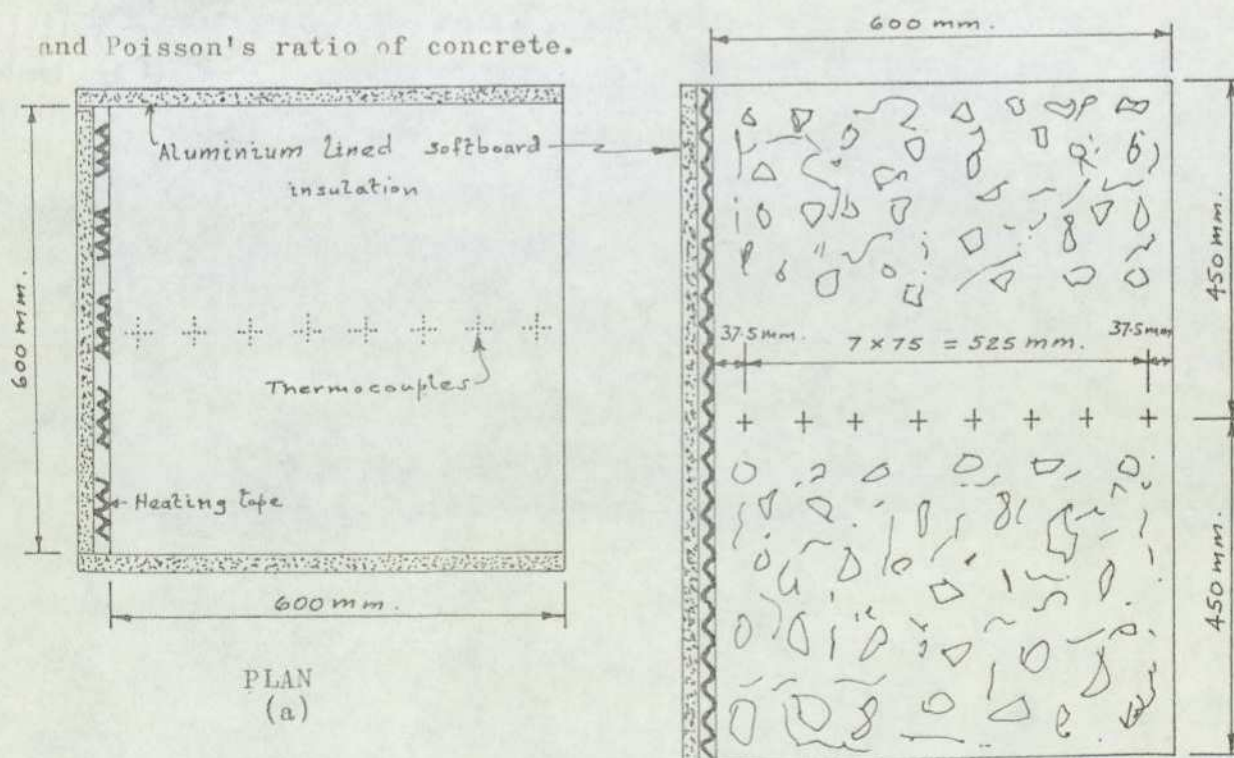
Plan and Sectional Elevation of Model Concrete Block
